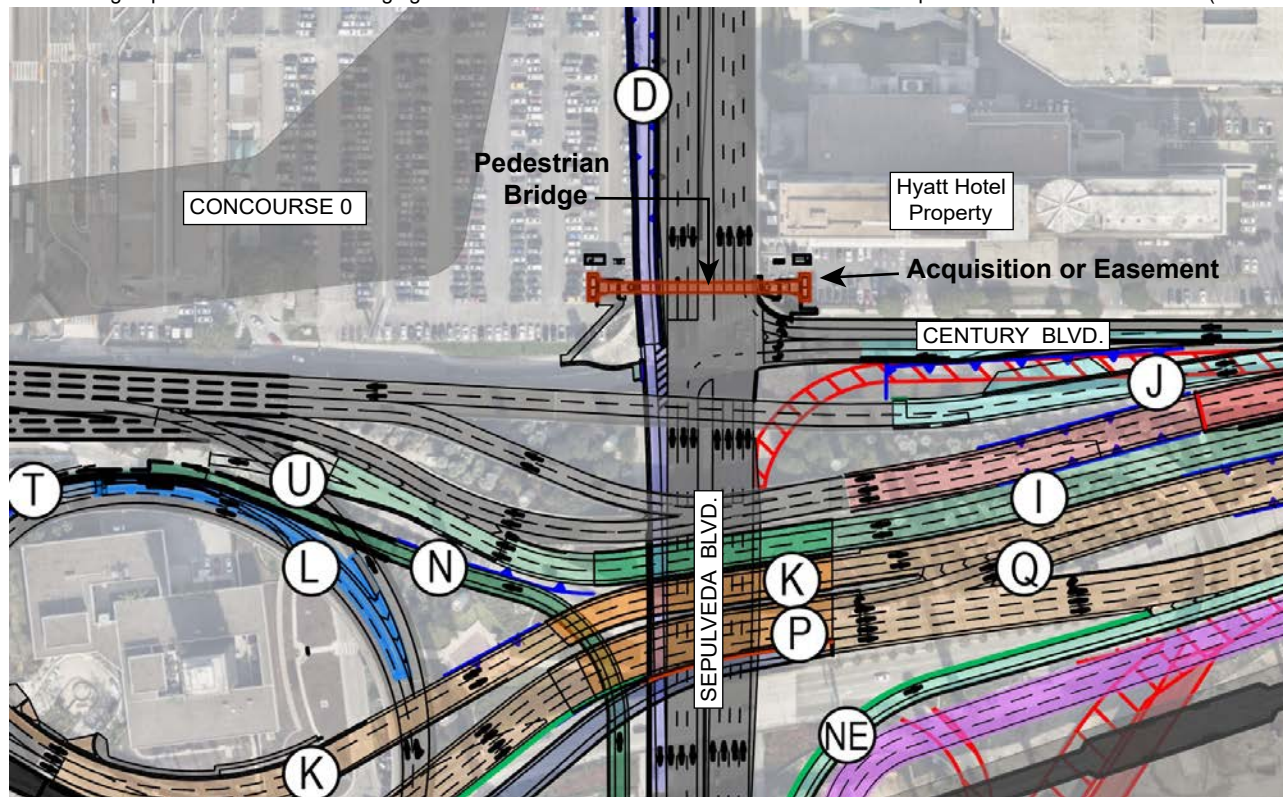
A pedestrian bridge would be added over the northern leg of the intersection of Sepulveda Boulevard and W. Century Boulevard. An acquisition or easement would be required on the Hyatt Hotel property for construction of the pedestrian bridge.
